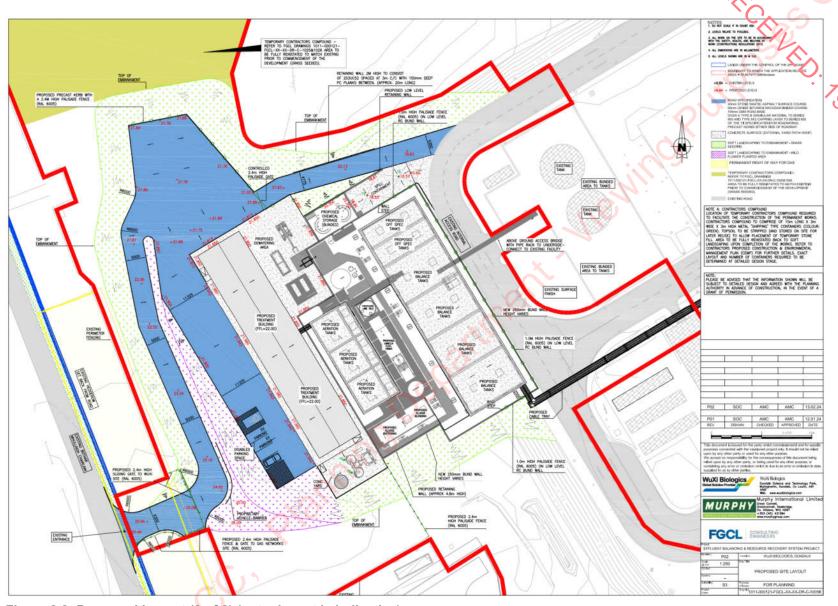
Proposed Layout (2 of 2) (note: layout is indicative)
